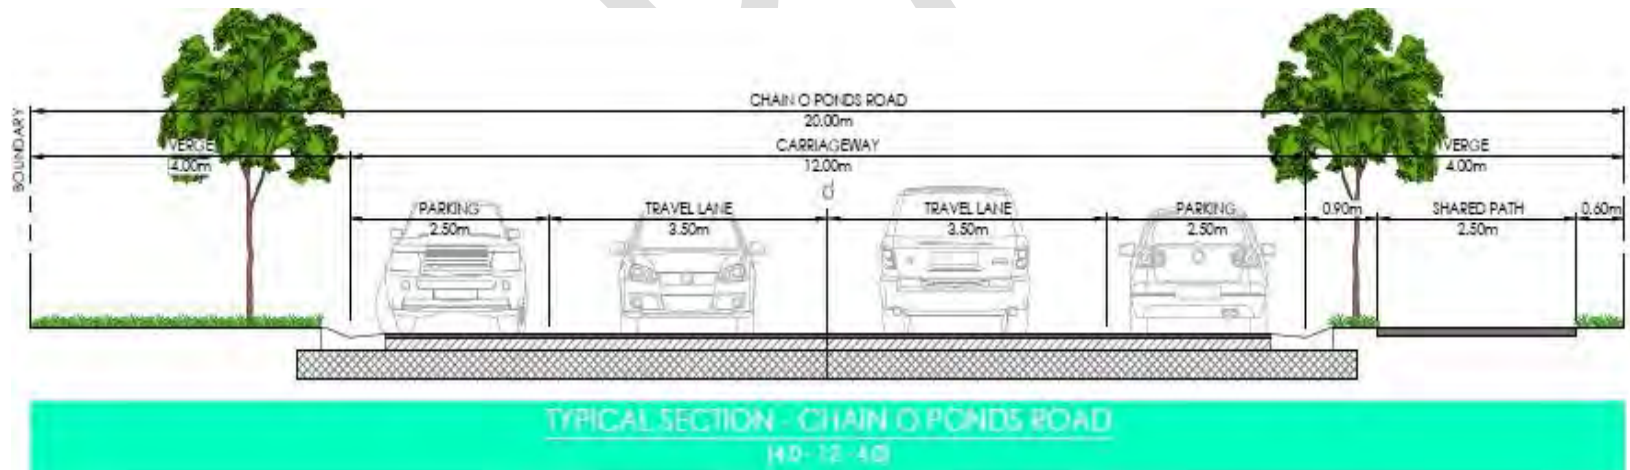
Entry Boulevard Road – Chain O Ponds Road
